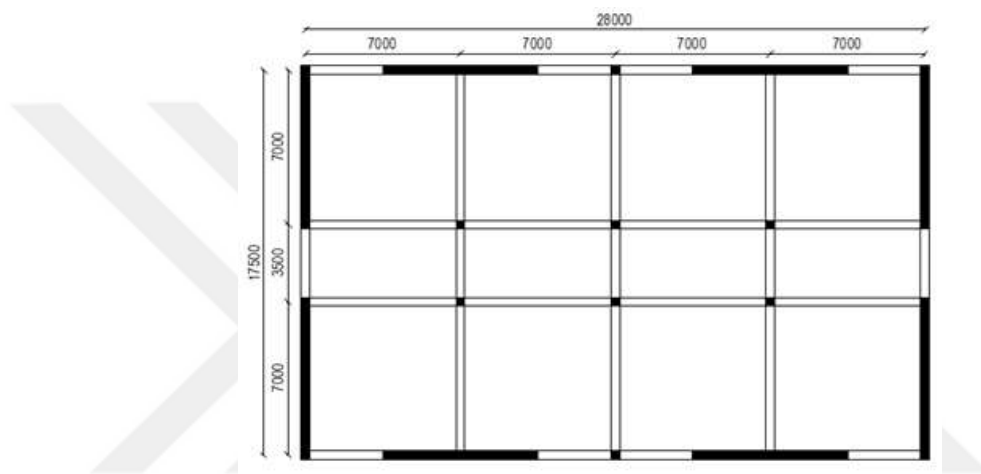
Typical floor plan of the sample building (dimensions are in mm).
